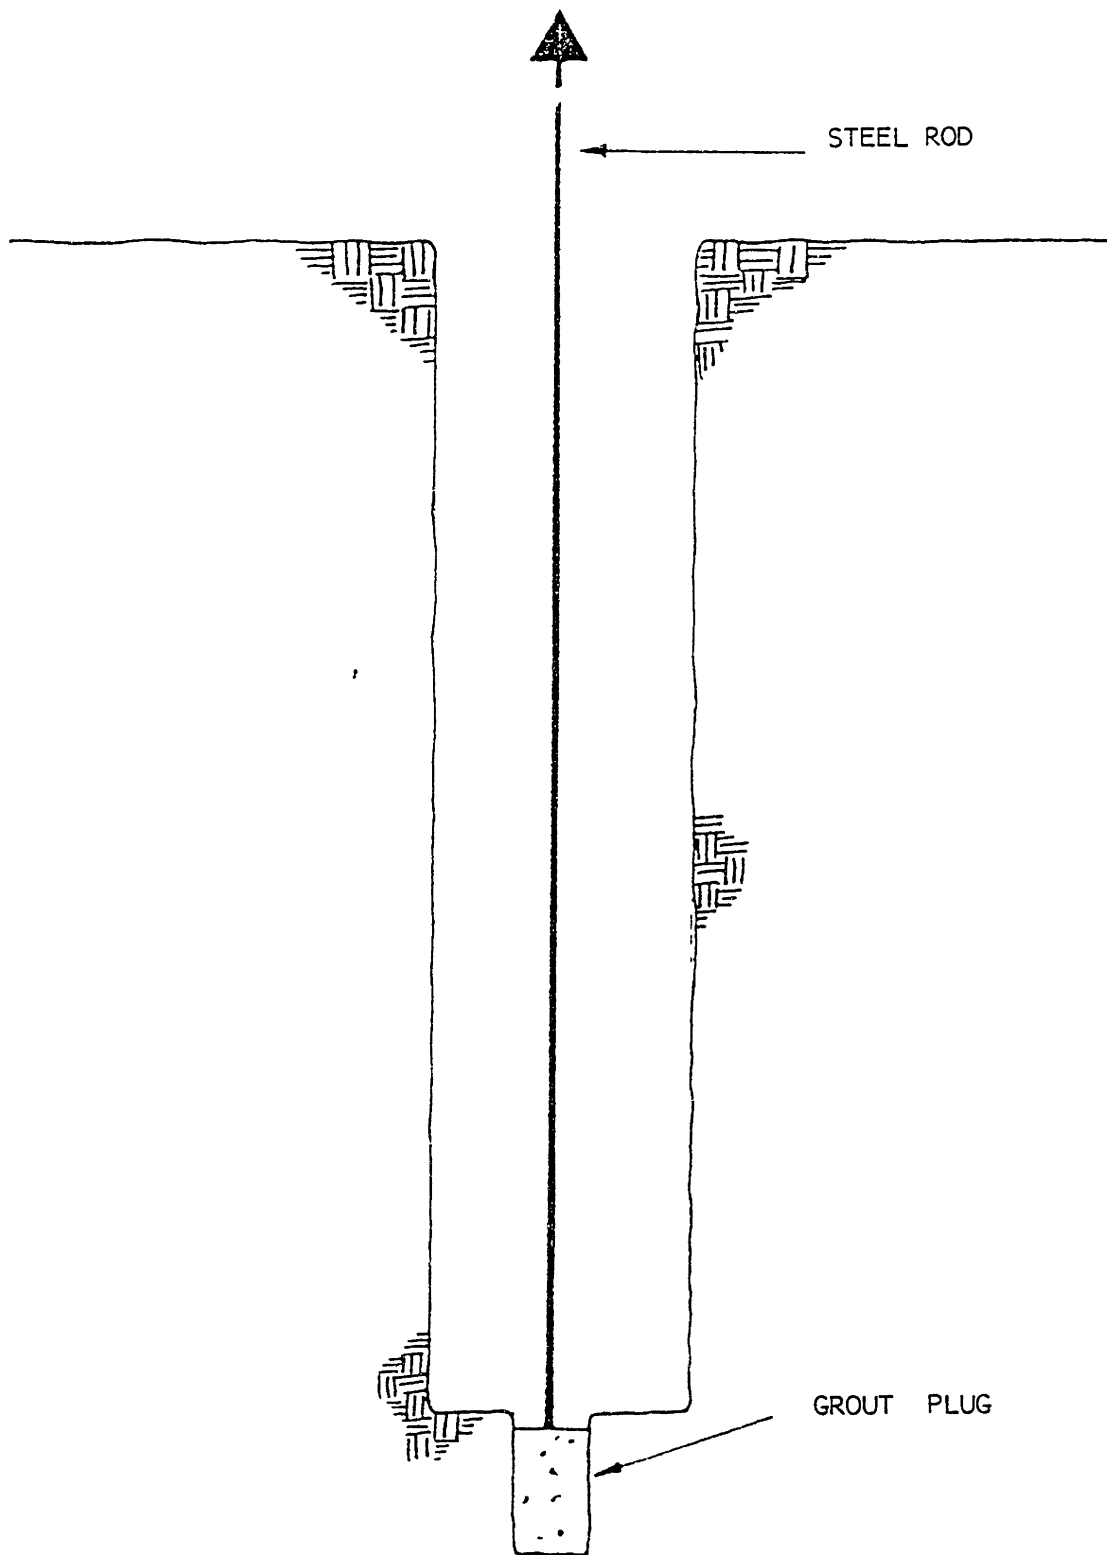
SCHEMATIC OF THE GROUT PLUG TEST ARRANGEMENT
